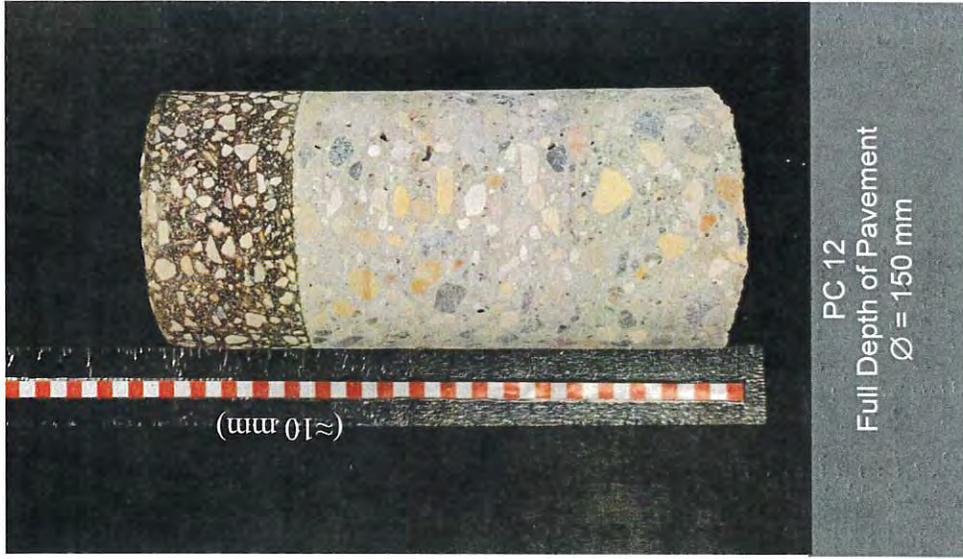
Specimen from Leila Avenue, Eastbound Curb Lane
